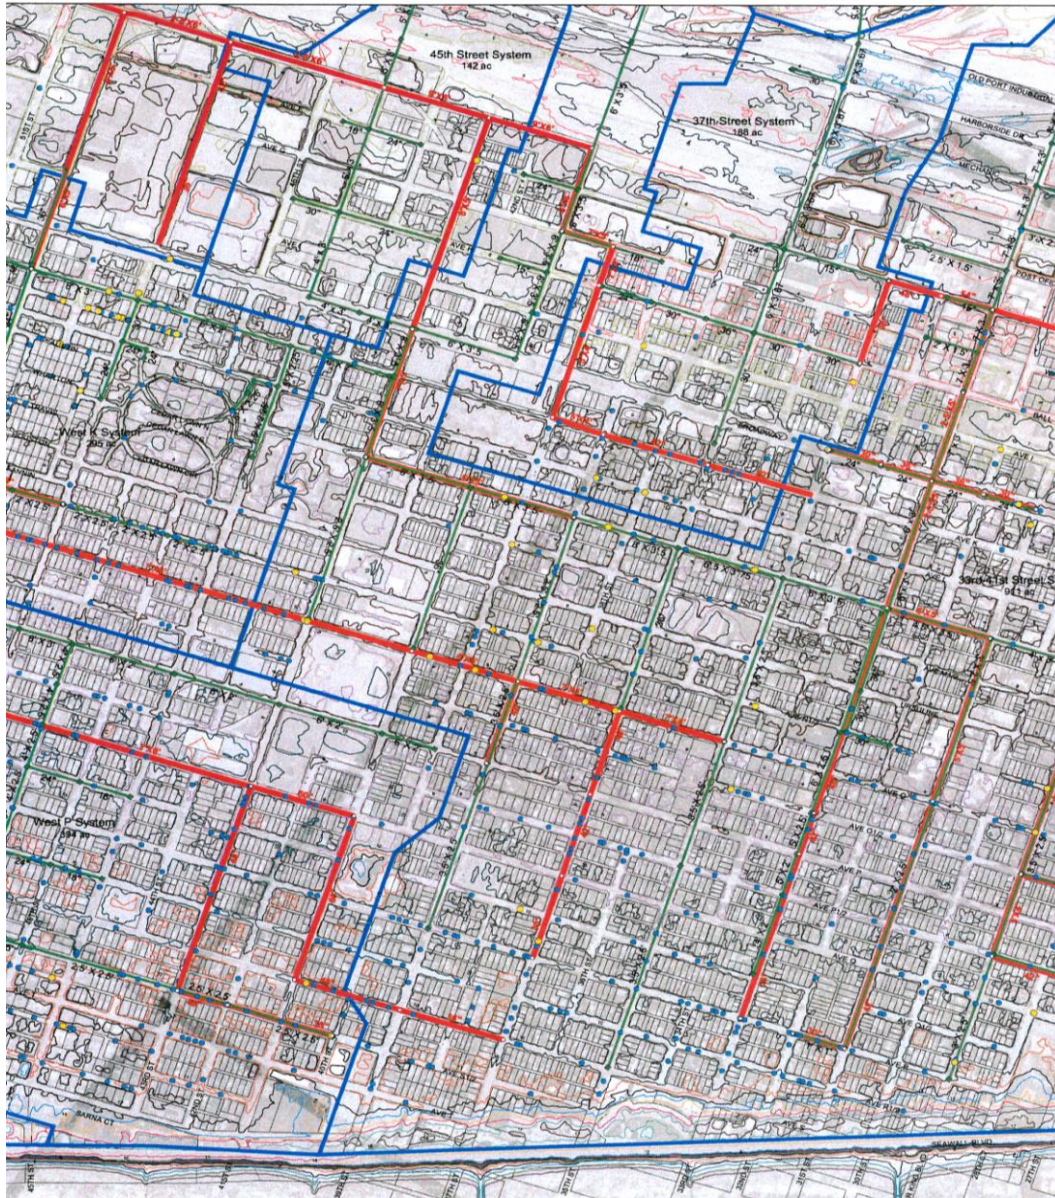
2003 Masterplan Stormwater Design Recommendations
